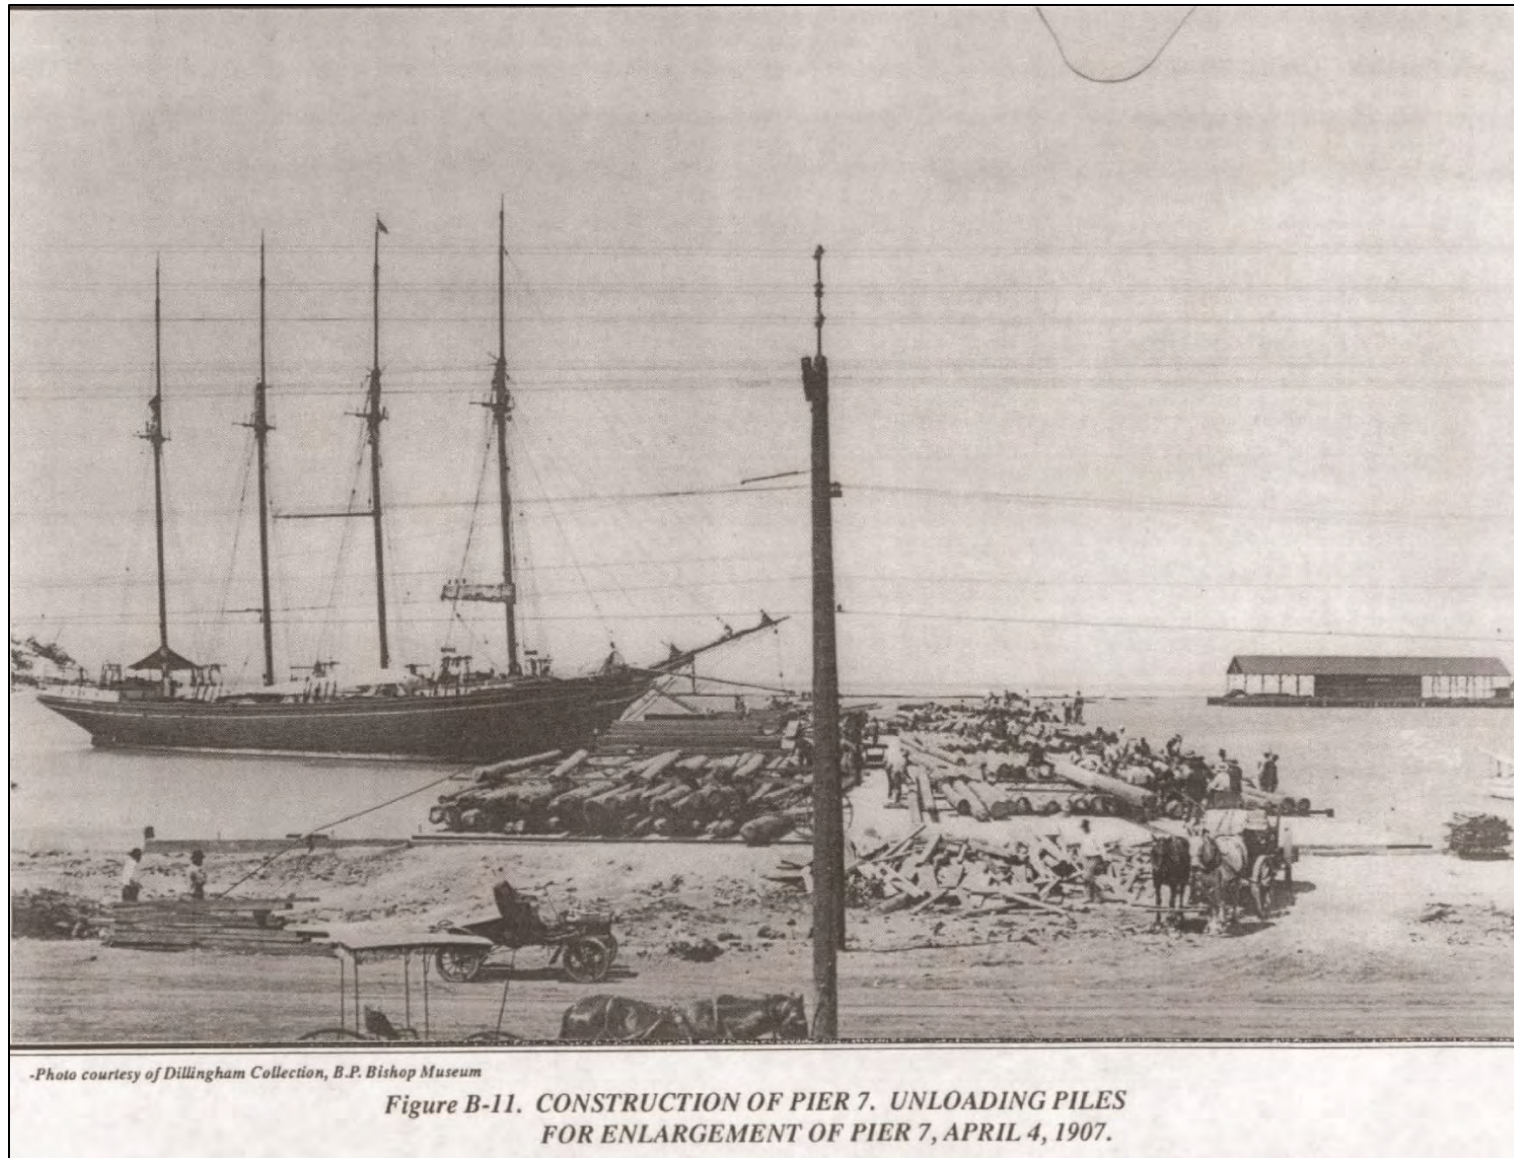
1906/1907 photo showing construction/enlargement of Pier 7 (Wong-Smith and Rosendahl 1990:Appendix B-11)
